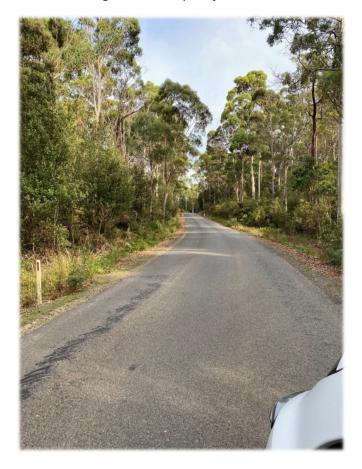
Road condition on Porters Bridge Rd near quarry access.
